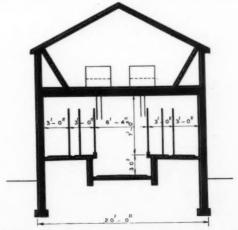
Standard cross section of U-type parlor showing basic dimensions. The use of overhead storage of grain is optional
